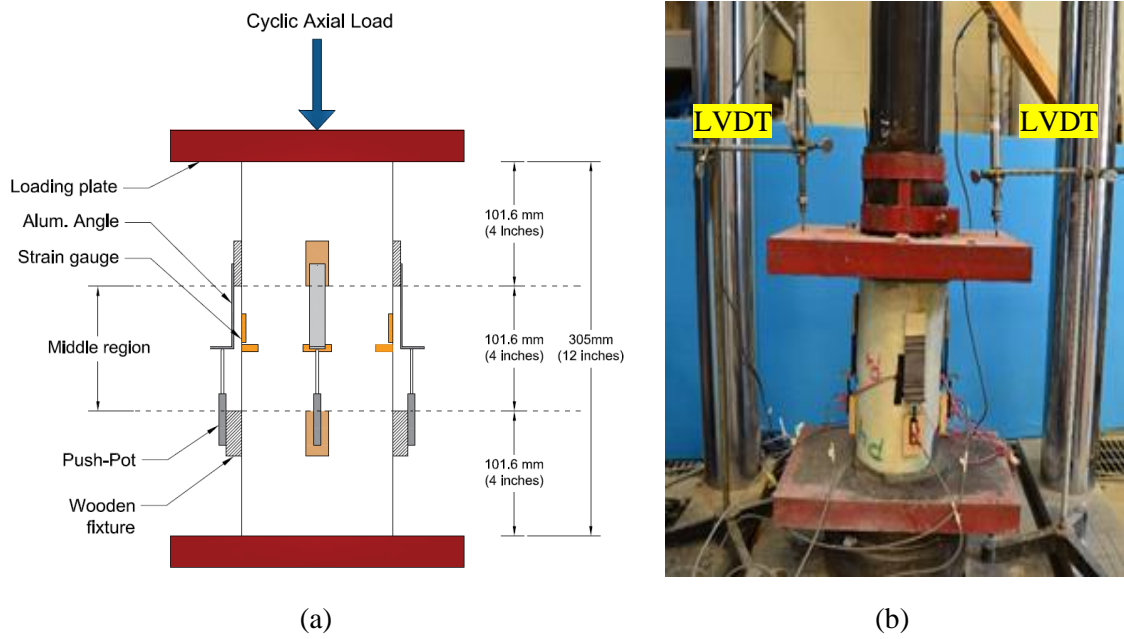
The CFFT (a) Instrumentation layout, and (b) Specimen during the test
